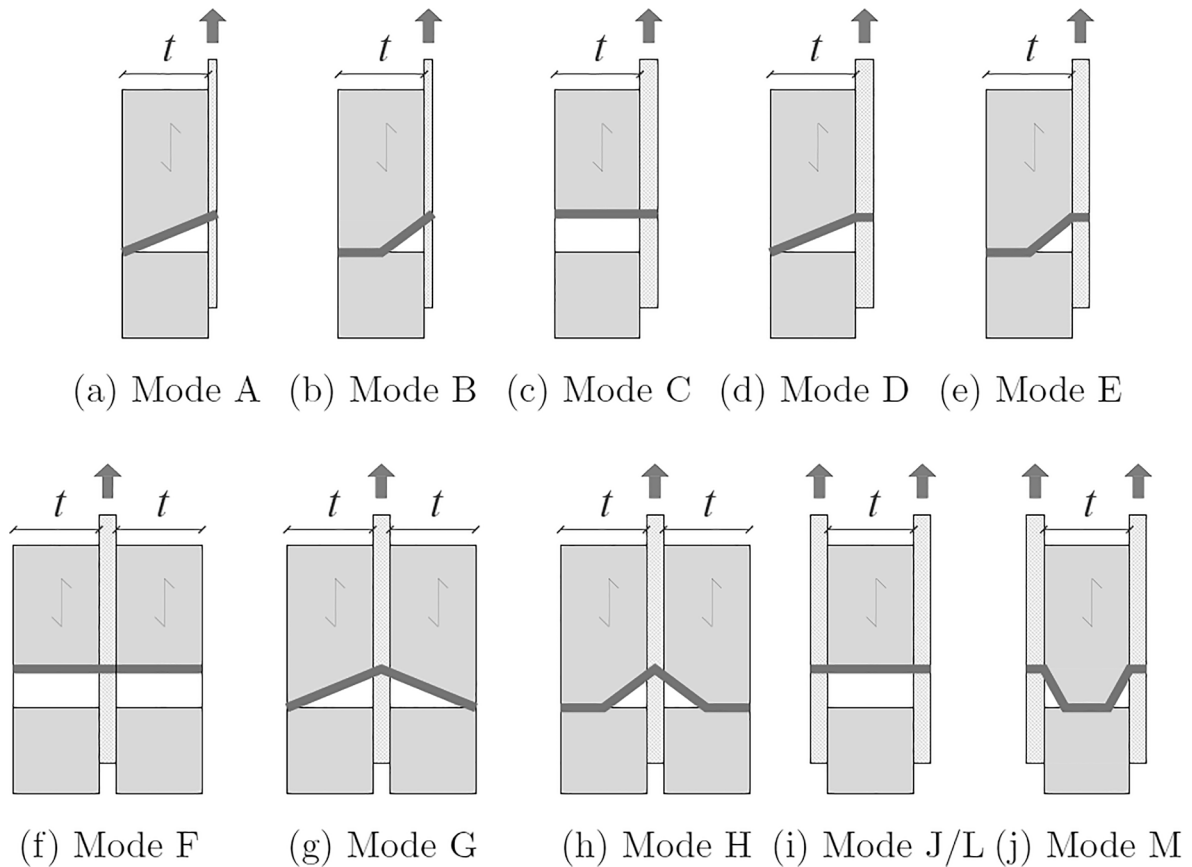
Yielding modes of the fastener considered by the EYM for timber-to-steel connections. Similar cases are considered for timber-to-timber connections.
